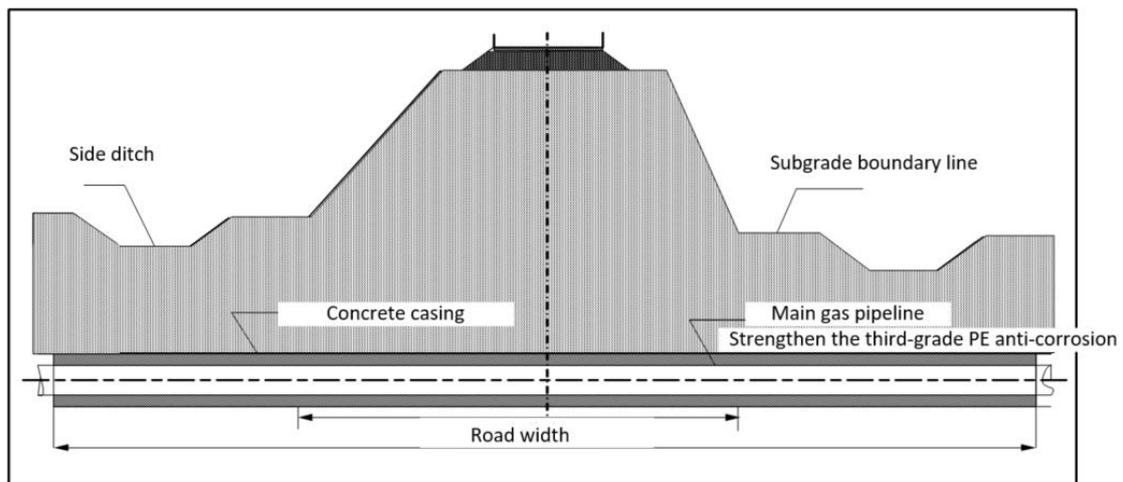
Sectional diagram of construction method for railway crossing
